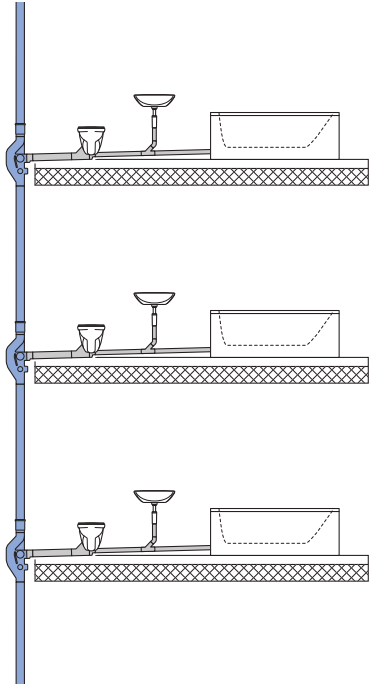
Installing one Geberit HDPE Sovent fitting per floor connection
